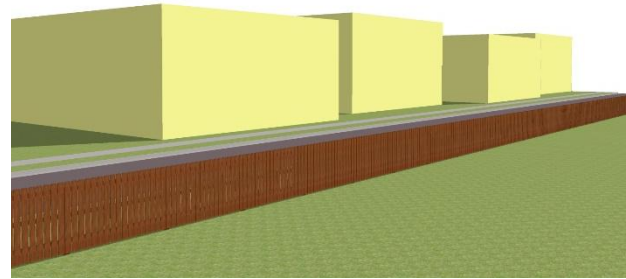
Appropriate example of a broken wall plane adjacent to a residential area.
